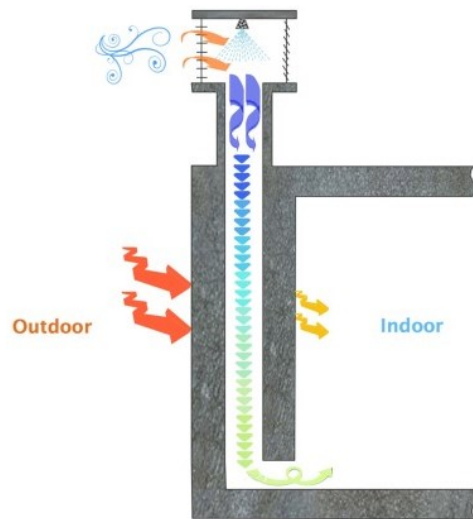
Schematic diagram of the ventilated wall cavity (Alaidroos and Krarti, 2016)
